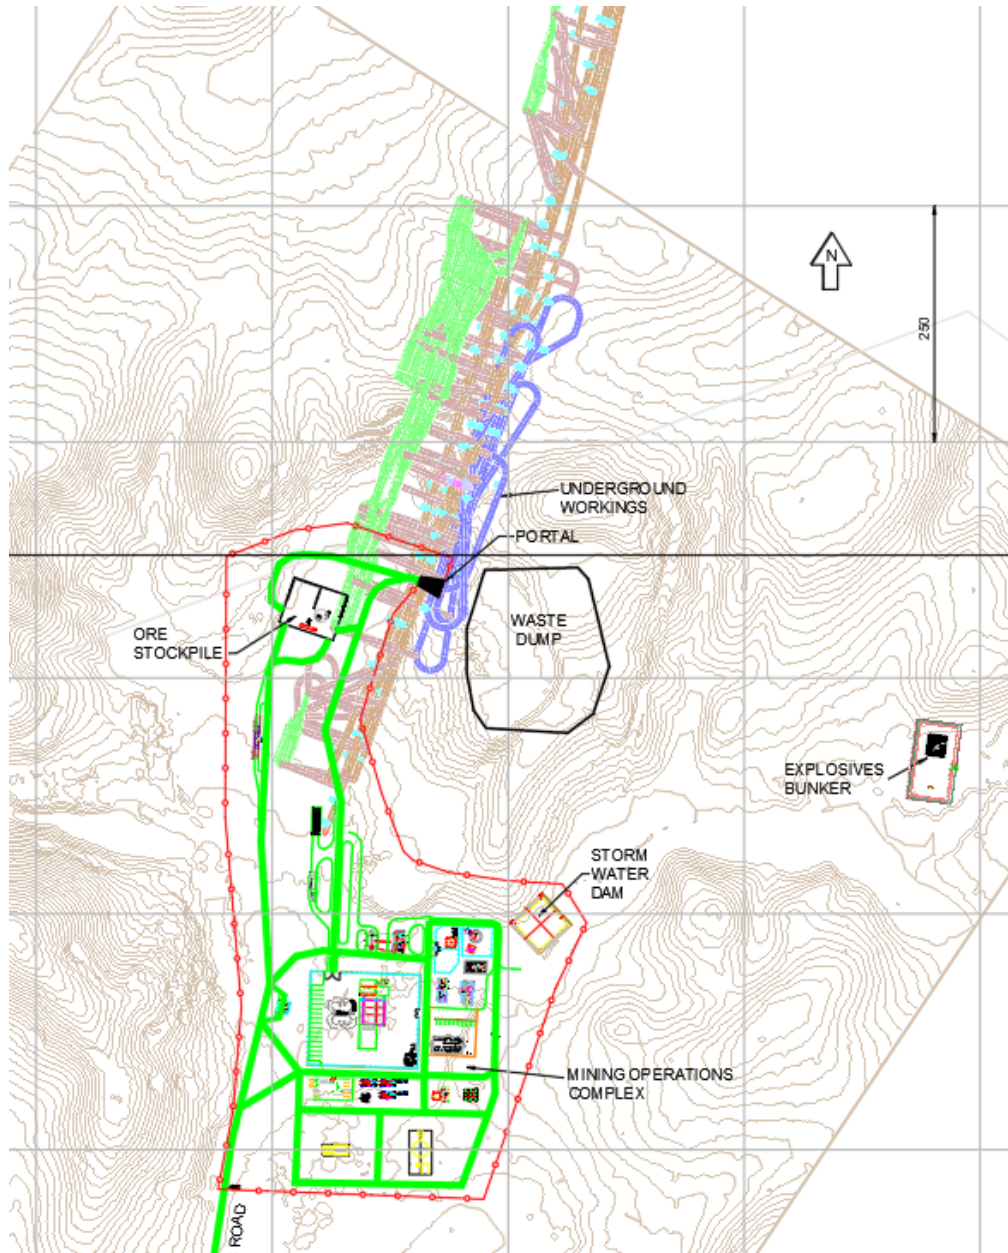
Sketch of the proposed mine site for Kubi (Bara 2022)
